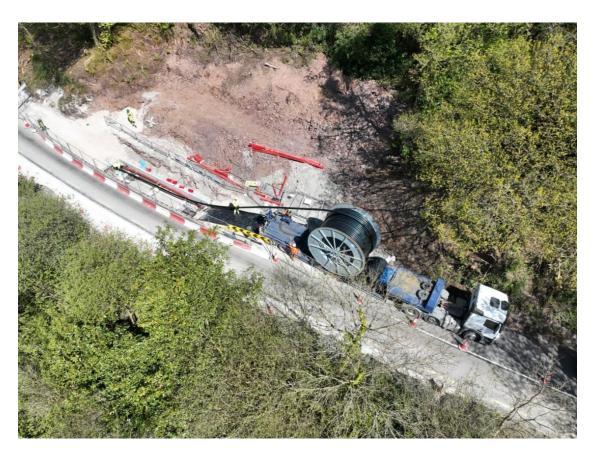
Example of a cable being pulled through a joint bay (source – Sorensens Civil Engineering - Celtic Interconnector)
